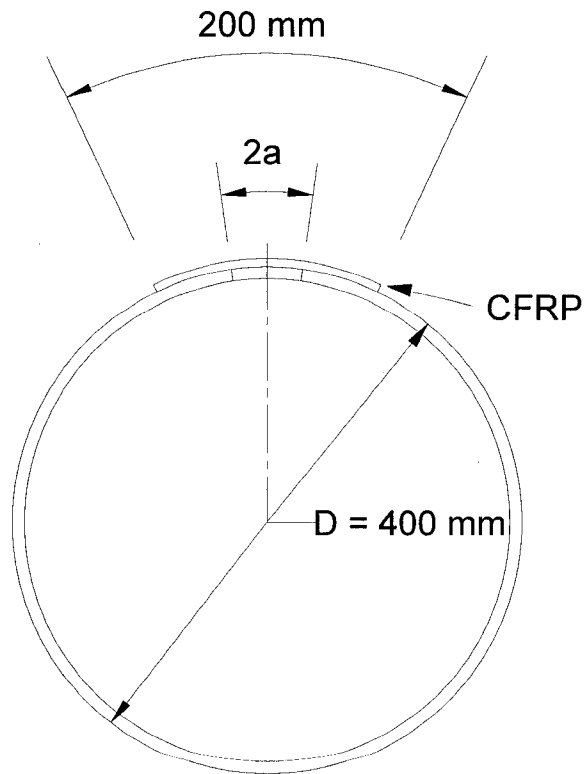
Section dimension, crack and CFRP detail of tube member
